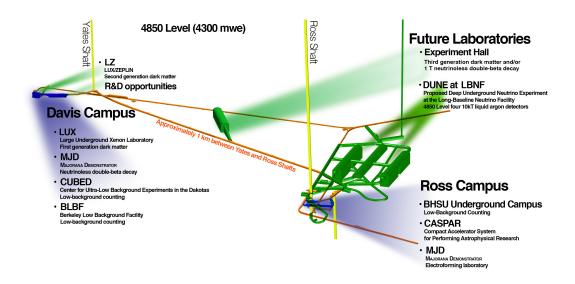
Underground cavern layout (SRK, Courtesy SURF)
